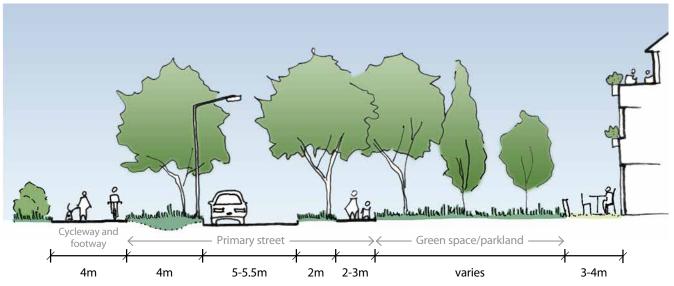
B-B – typical primary street cross section (refer to Fig. 18 for section location)
